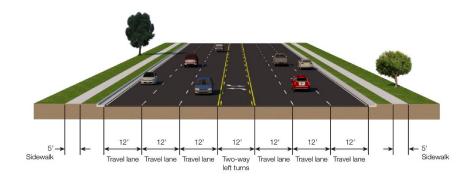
Typical Six-Lane with Center Turn Lane Roadway Section for Parallel Corridors
